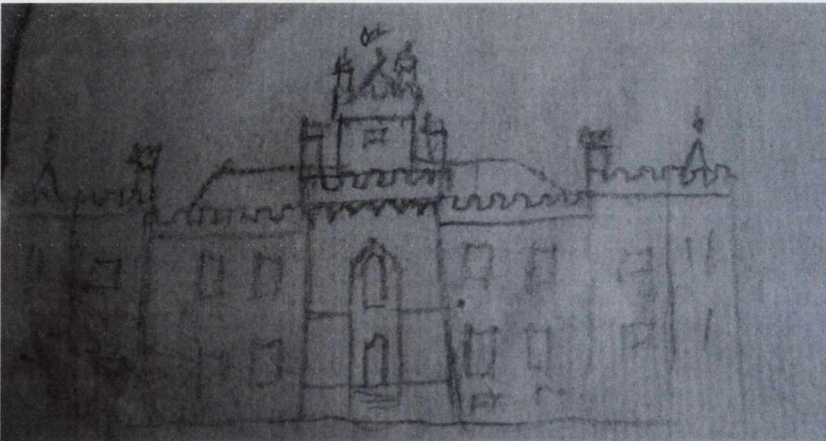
Birr Castle, sketch of proposed north elevation, Laurence Parsons, [1802–1803], Sketch notebook, f. 9v.
